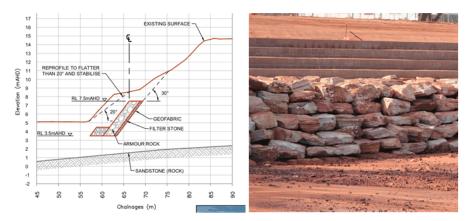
Typical section of Option 1 (left) and example low crested revetment (right).
